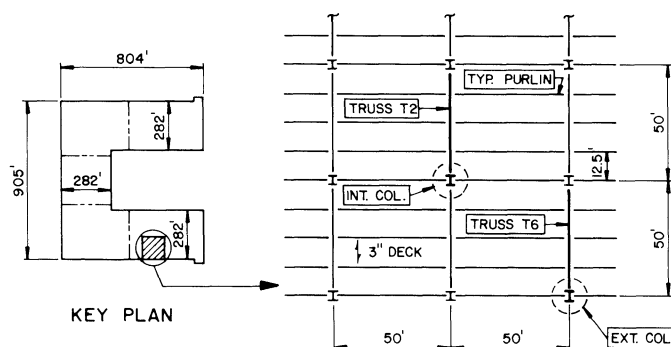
Project A—Industrial building roof framing: aircraft repair facility
